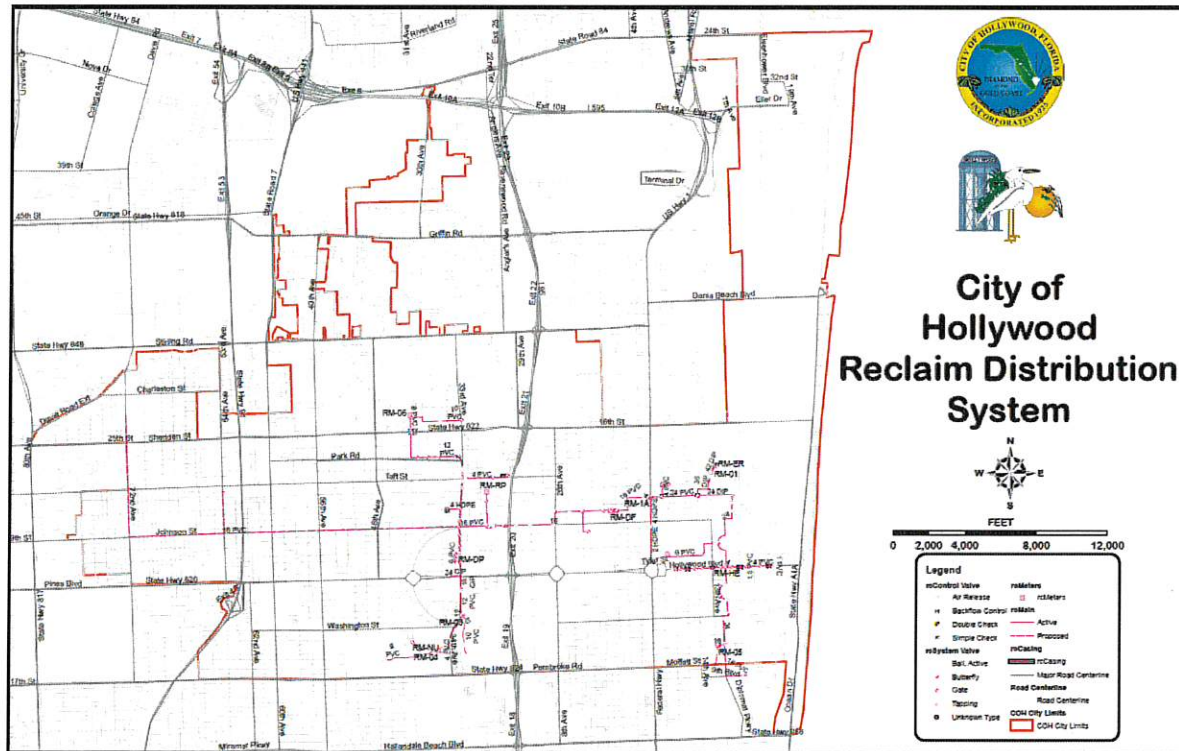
Existing and Proposed Reclaimed Water Transmission Infrastructure
